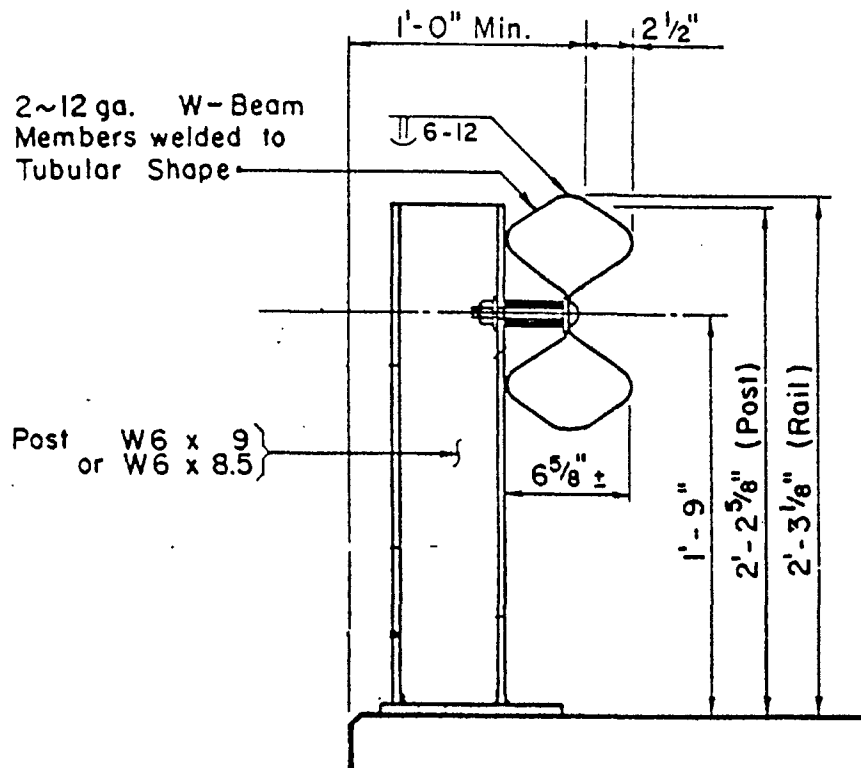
Texas Type T6 Bridge Railing Cross-Section
